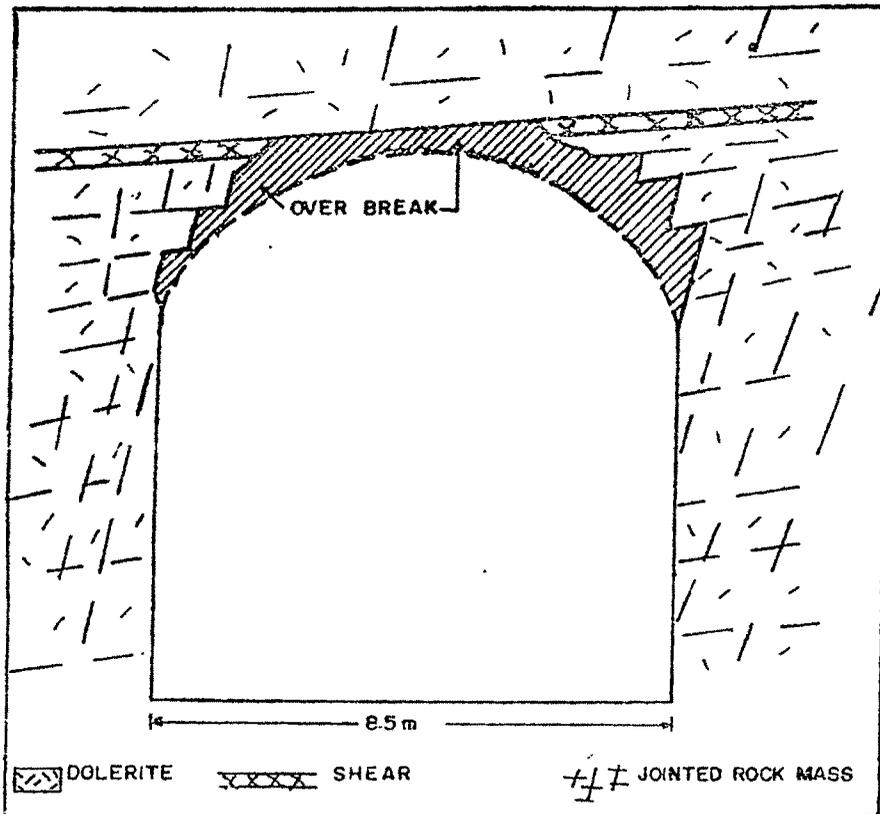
GEOLOGICAL CROSS-SECTION OF ACCESS TUNNEL SHOWING OVER BREAKS
